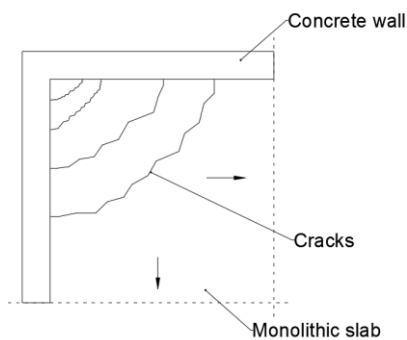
Shrinkage induced cracking as result of restraints by wall elements.
